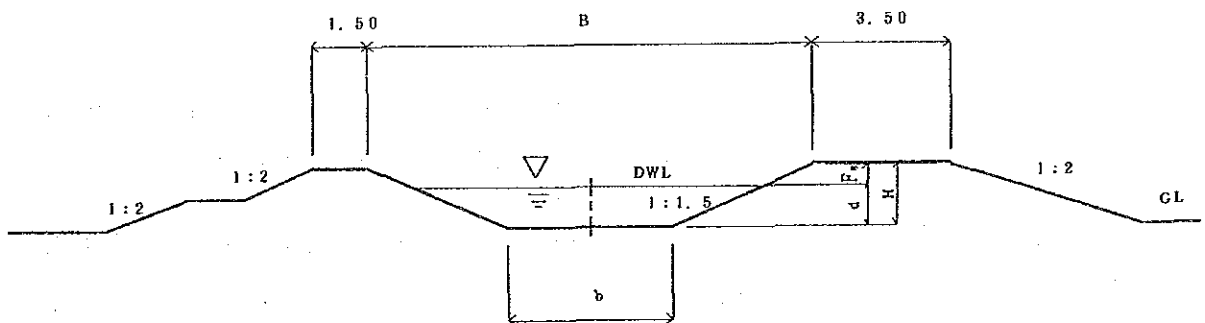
Typical Cross Section of Secondary and Sub-Secondary Canal
